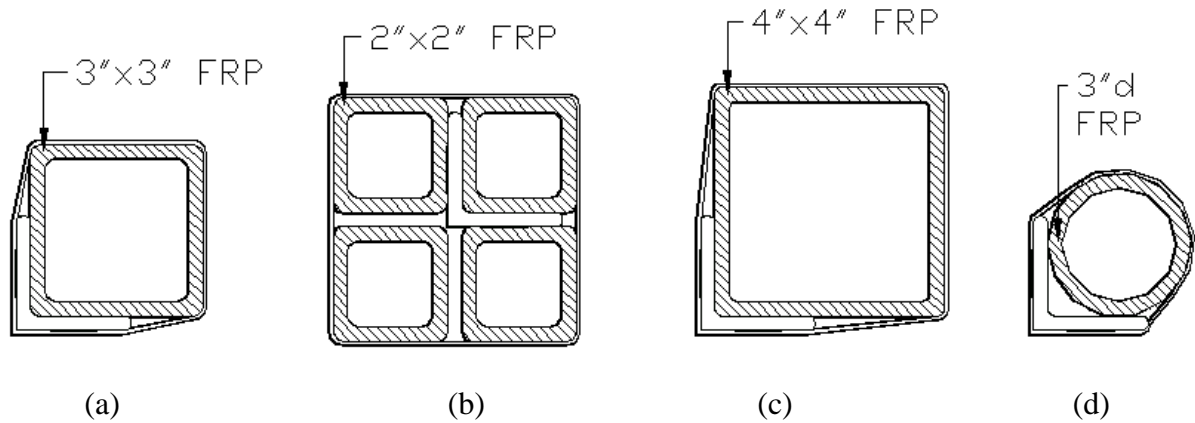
Cross Section of All Specimens Retrofitted with FRP.
